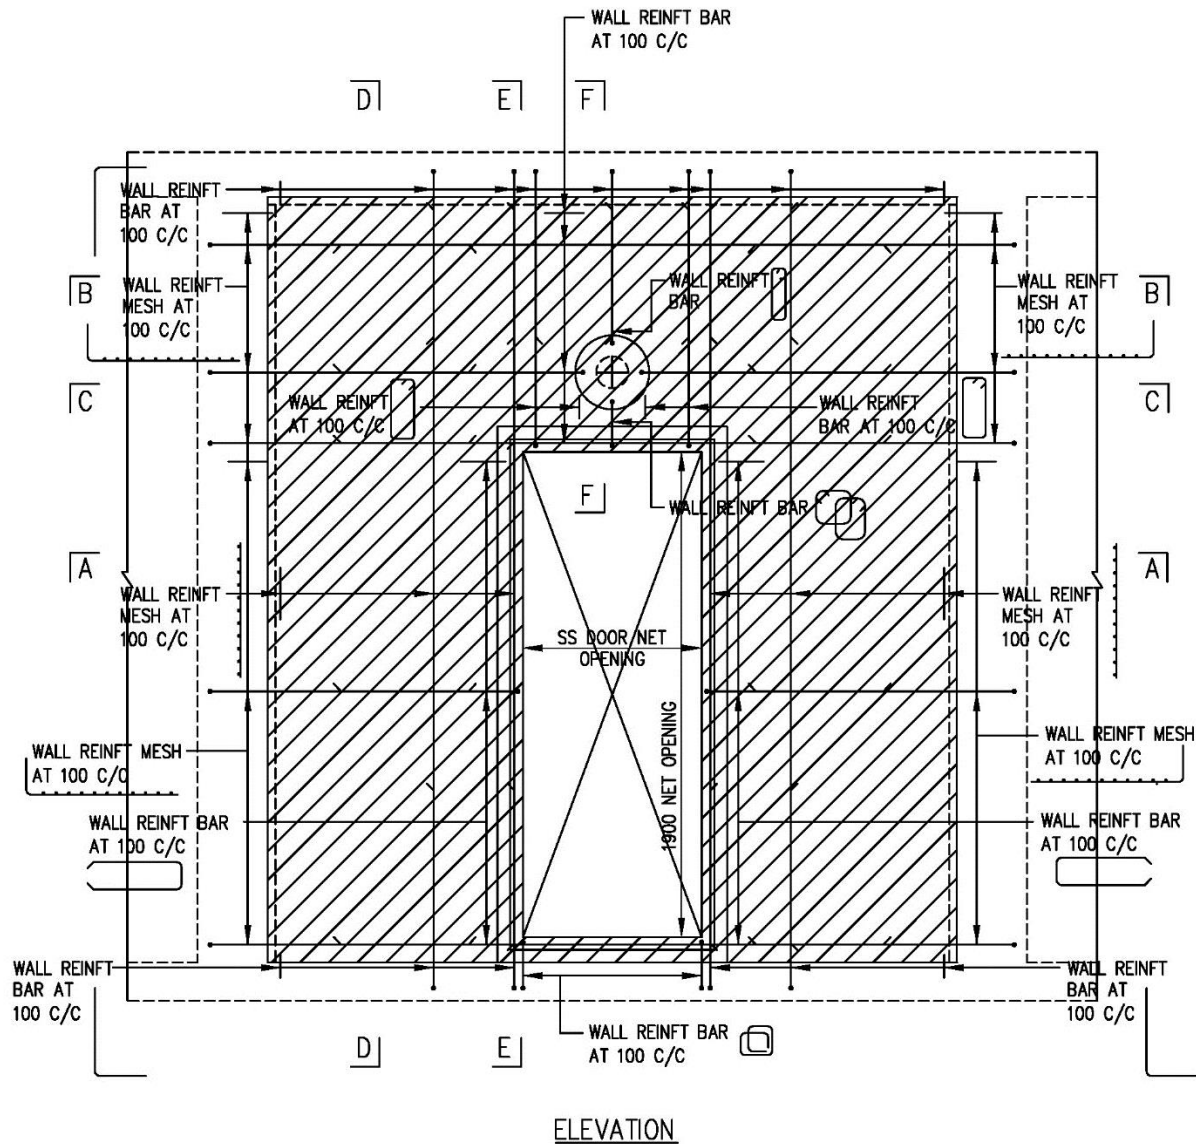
PLAN OF PRECAST HS, SS or SSS DOOR FRAME (TYPE 3)
